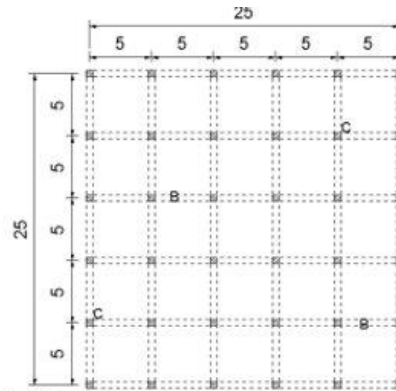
Typical floor plan of moment-resisting frame system (units in meter).
